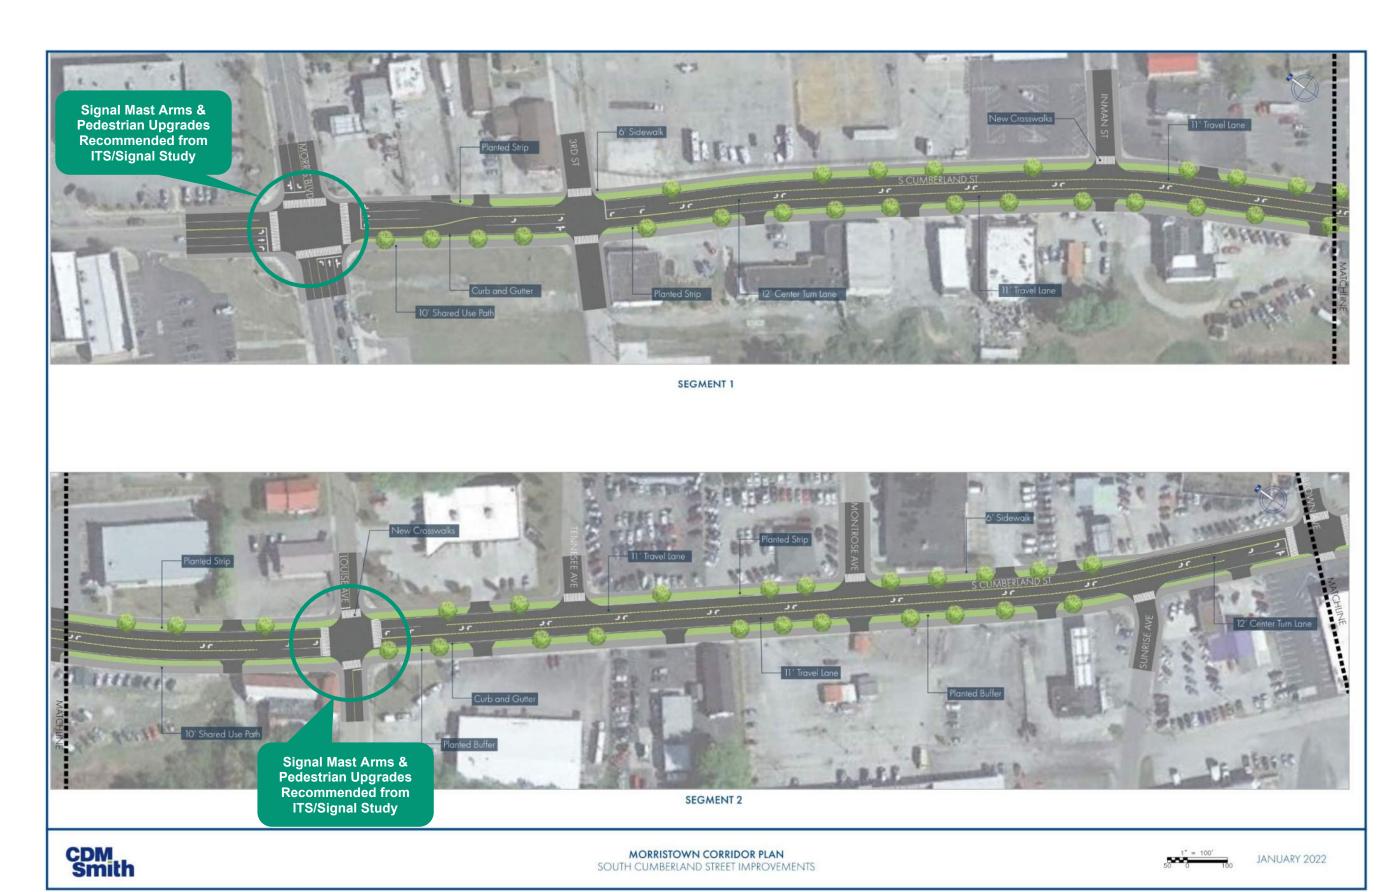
Proposed Concept Layout Sheet 1 of 3 (Segments 1 and 2)
